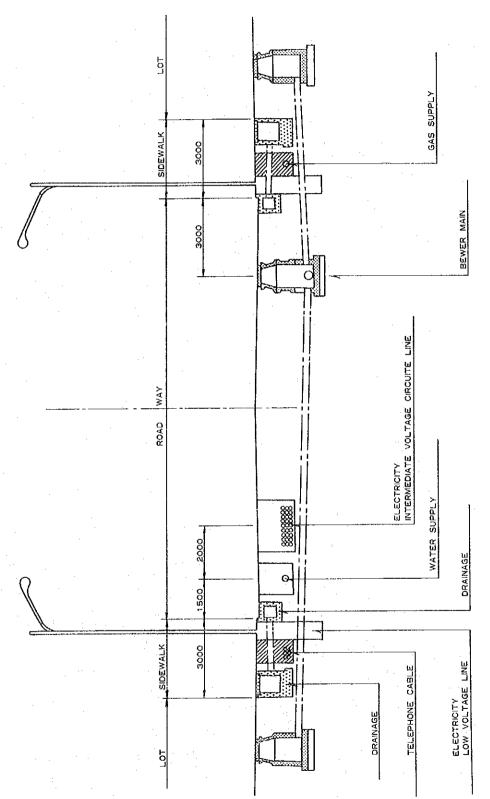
TYPICAL ARRANGEMENT OF UTILITY LINES IN STREETS
